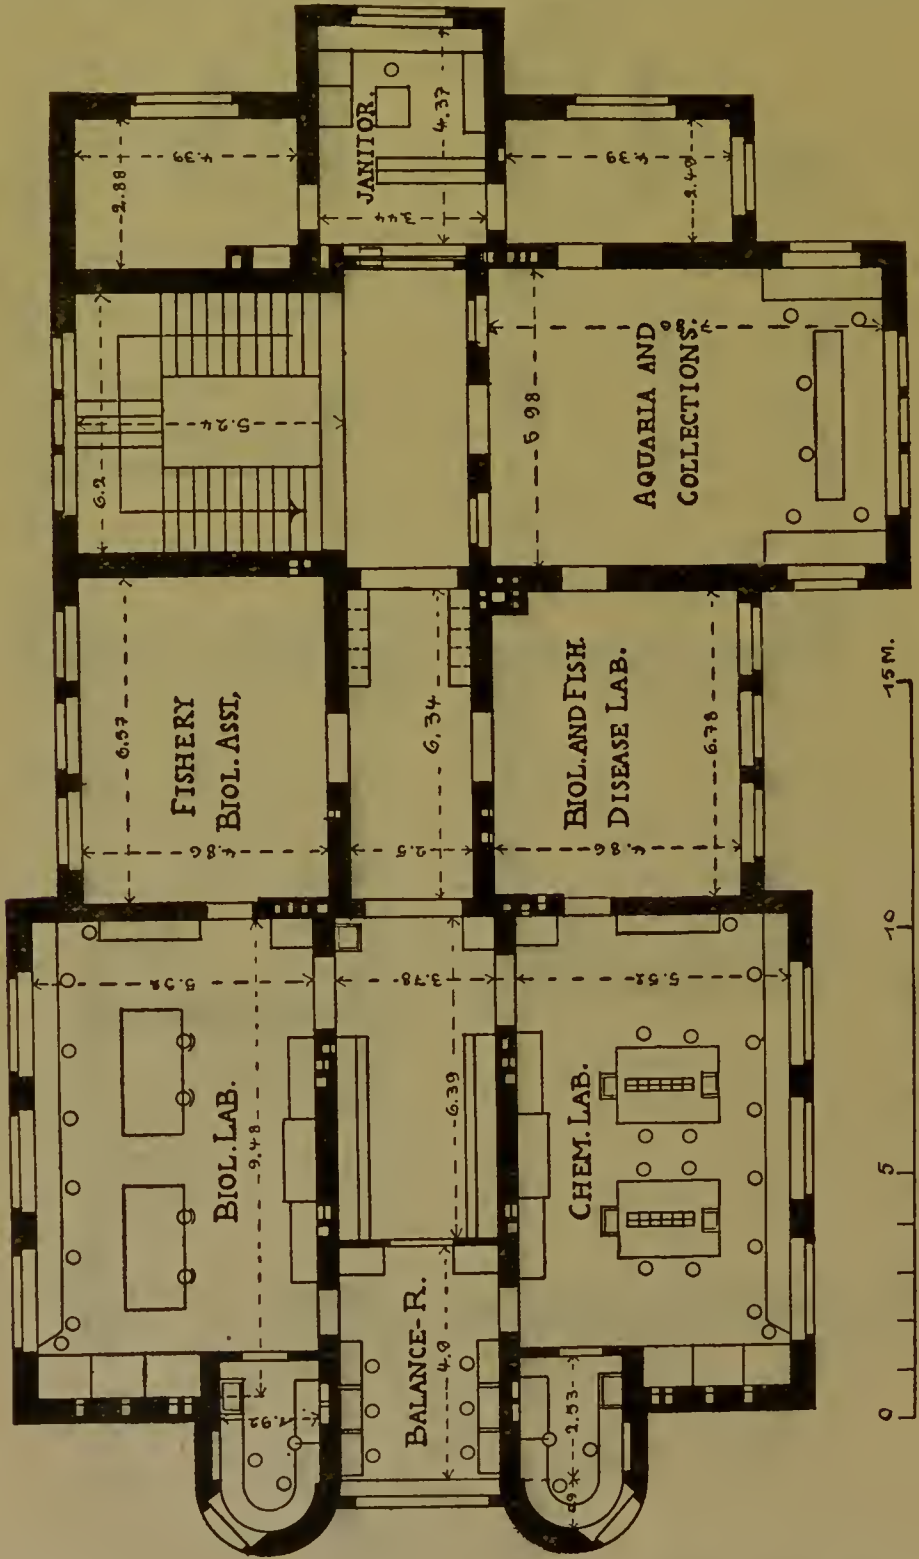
Plan of second floor of Friedrichshagen Institute.
